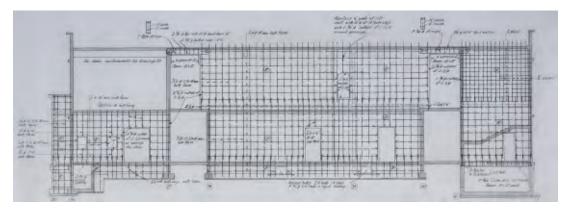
Surgical Block – Original Wall Reinforcing Elevation
